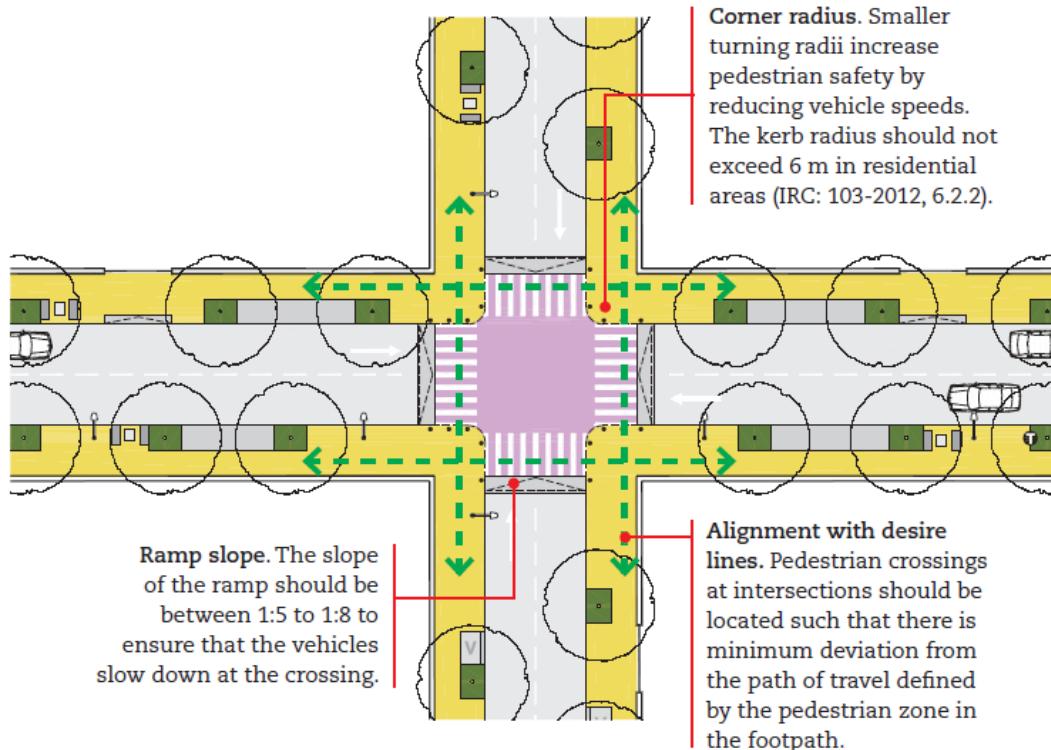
Concept layout of non-signalised 4-arm junction with raised pedestrian crossing
